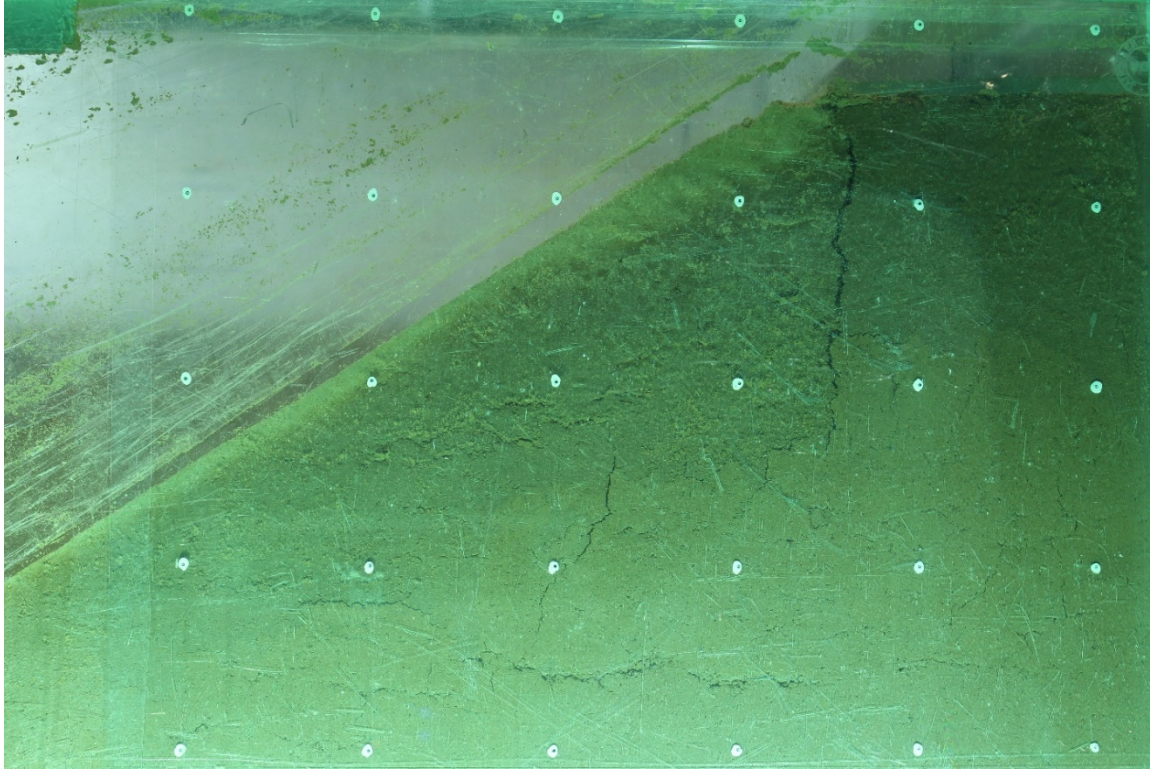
Final image of test showing a large crack that formed during Test B6 (23.0 % MC)
